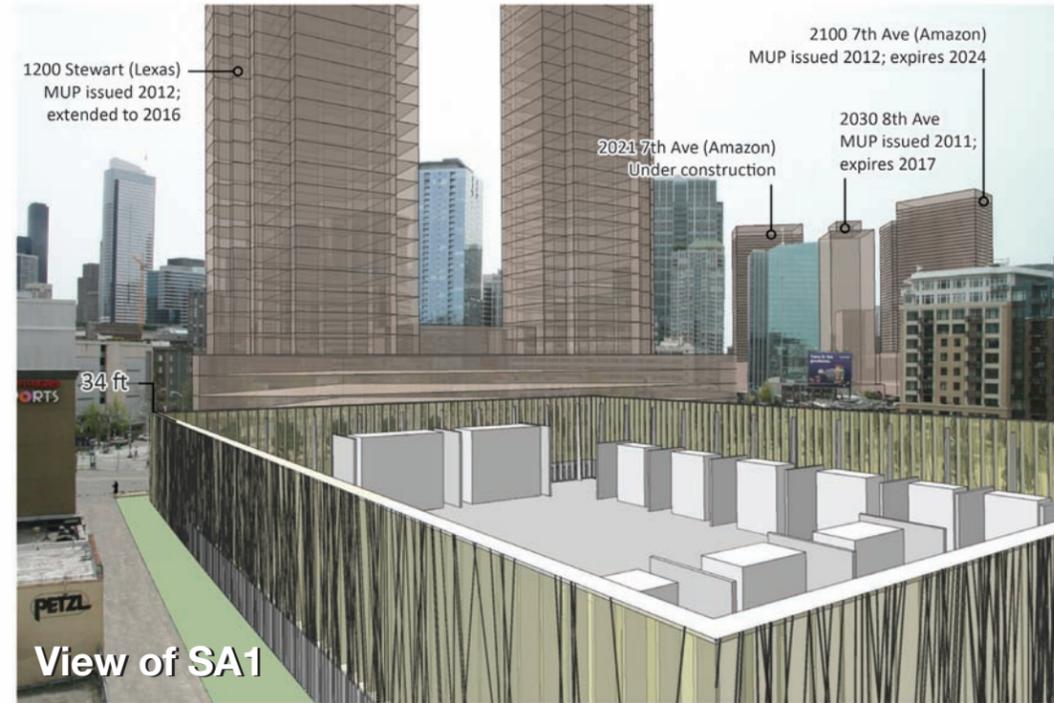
Building View 2 of Proposed Substation from SCCA
